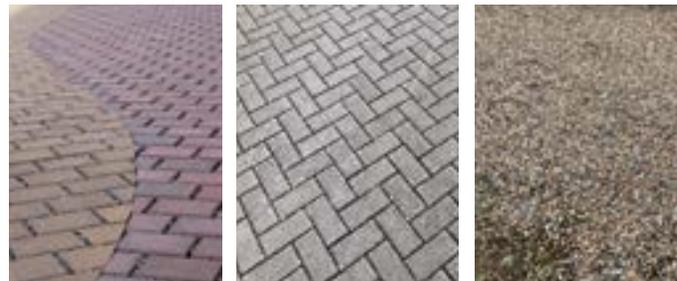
Examples of permeable paving treatments: unbound clay pavers (left), precast concrete setts (centre), and gravel (right).
